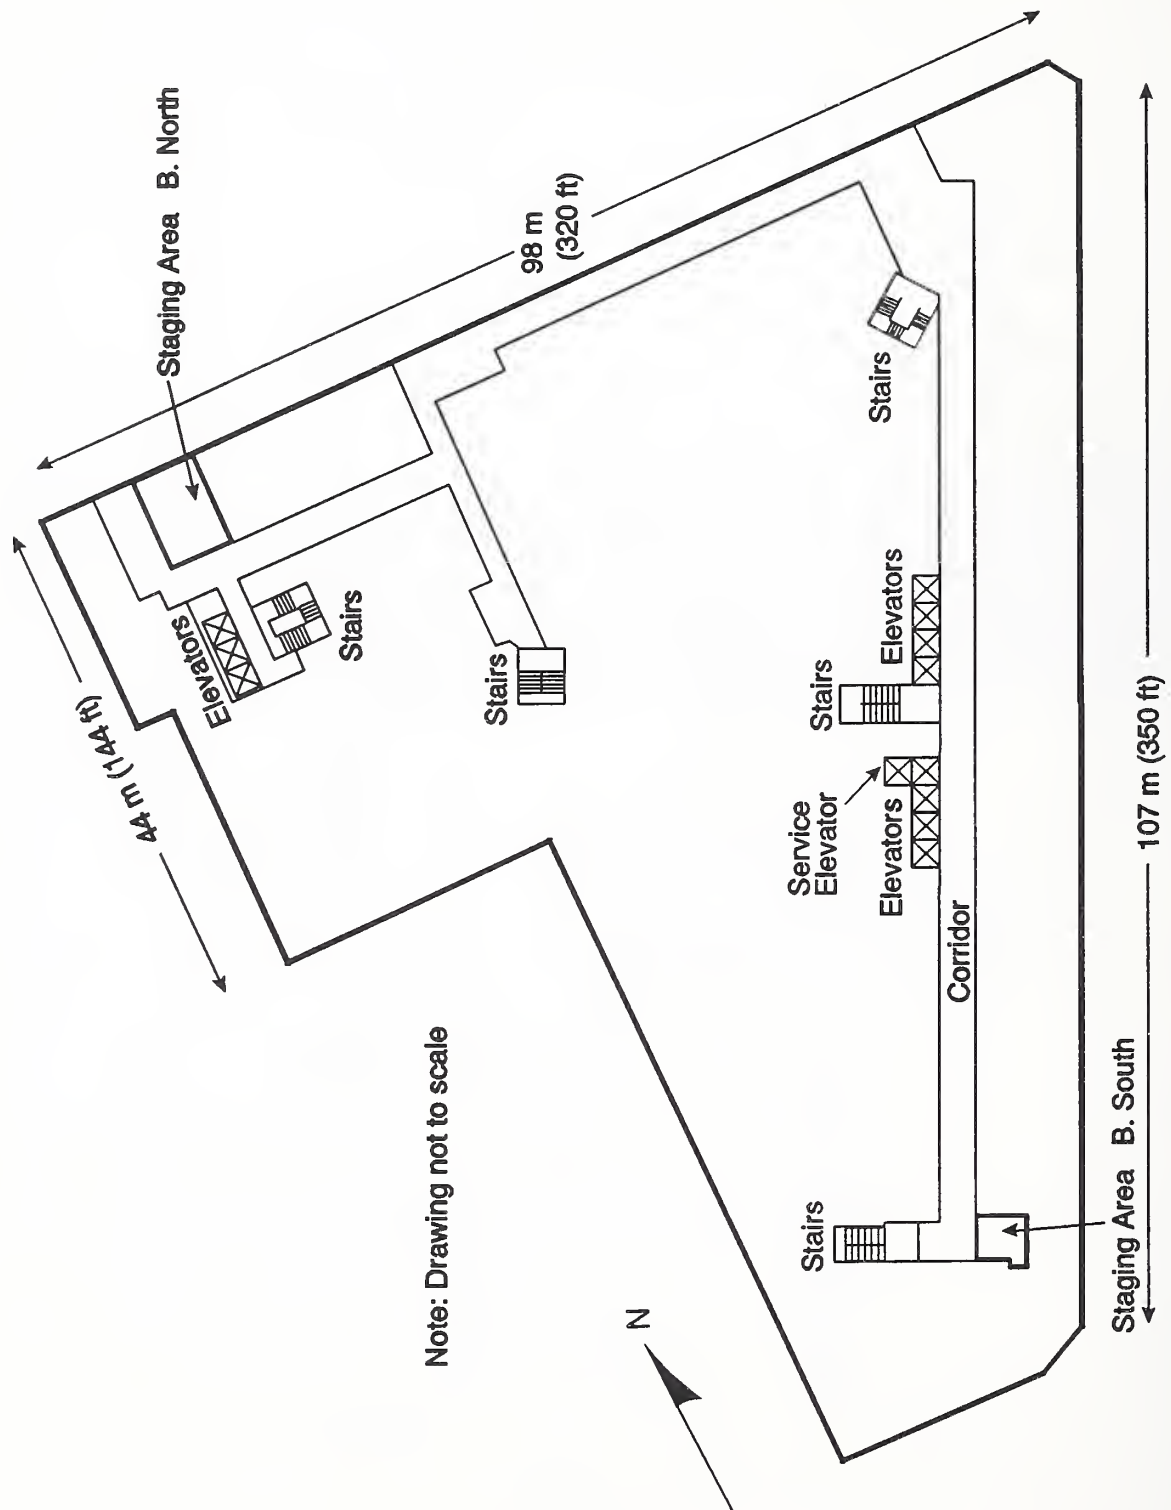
Basement B plan of the Department of Veterans Affairs Building
